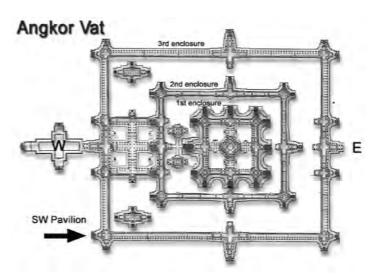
Construction Plan of Angkor Vat Temple, with the Southwest Pavilion marked.
